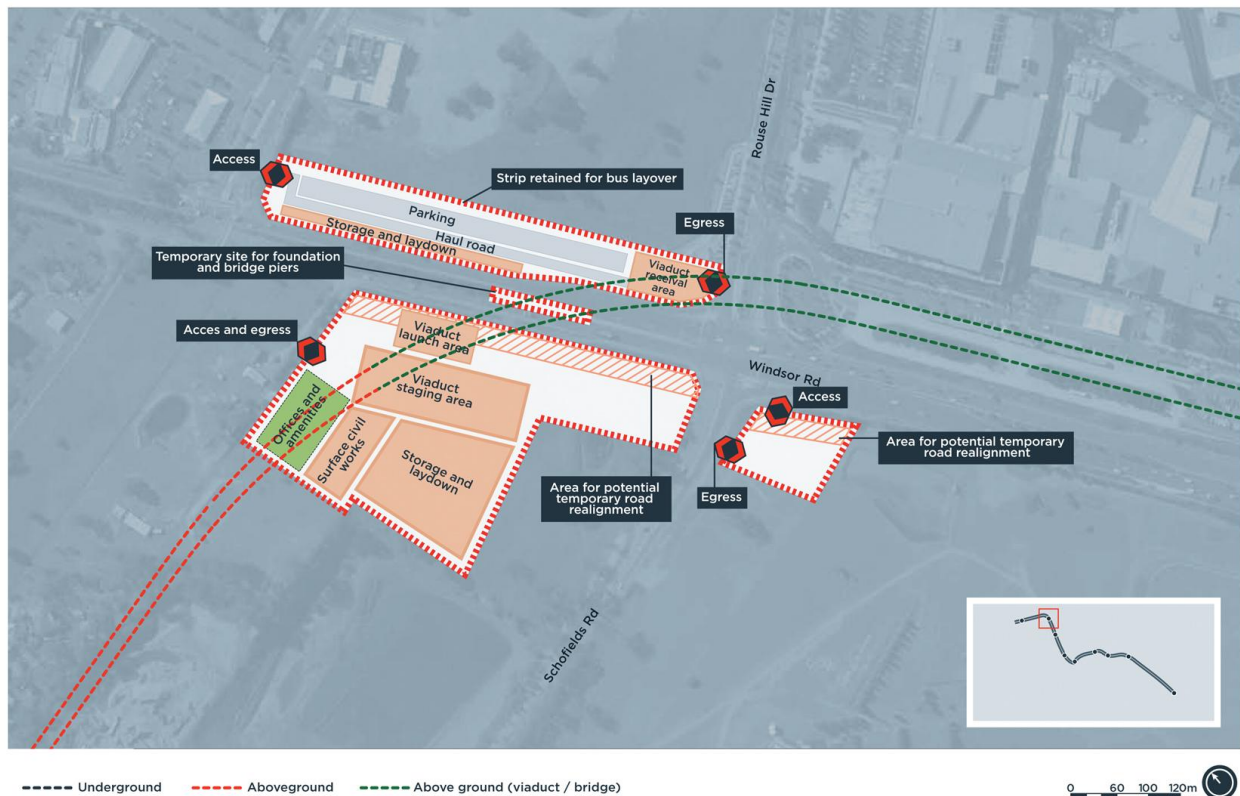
Windsor Road Construction Site 15 as shown in EIS 1
